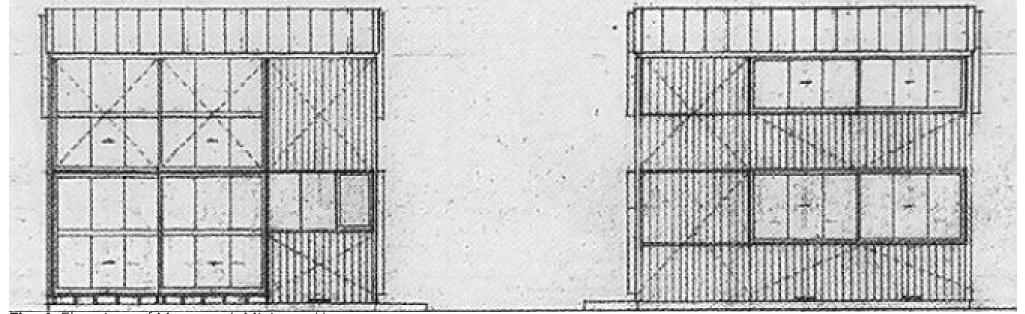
Elevations of Masuzawa's Minimum House Image: The Japanese House pp 045
